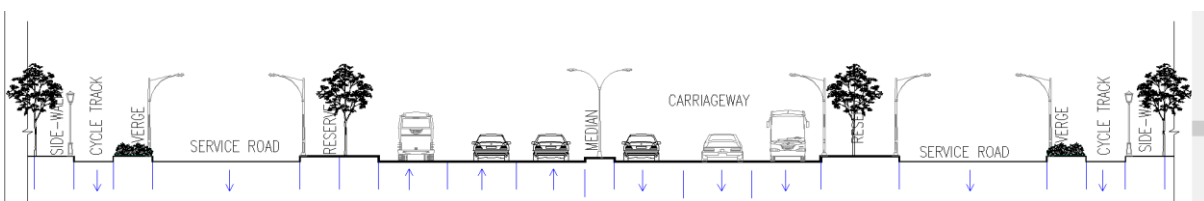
Proposed Major Arterial Road Section (Source: Author)
